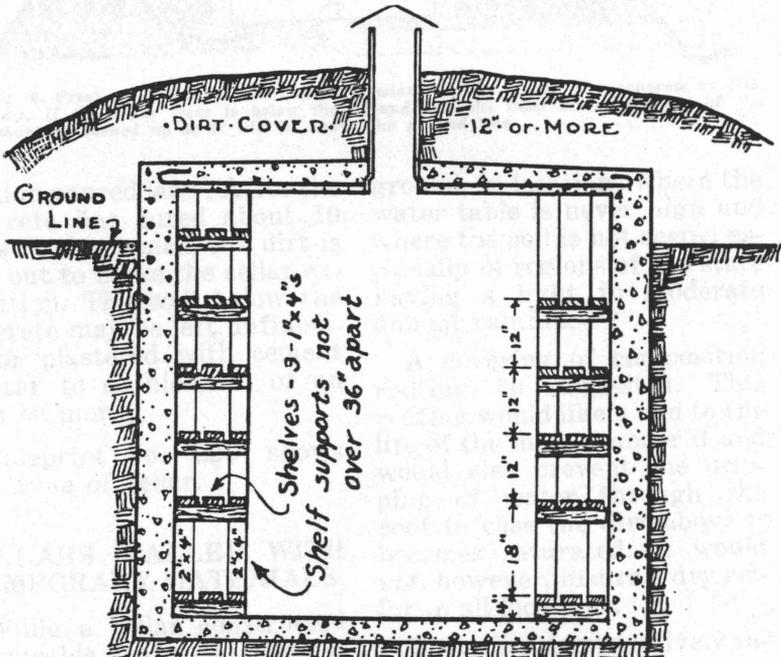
Section through concrete cellar showing standard shelving. Plans for construction are shown on Blueprint No. 62.
